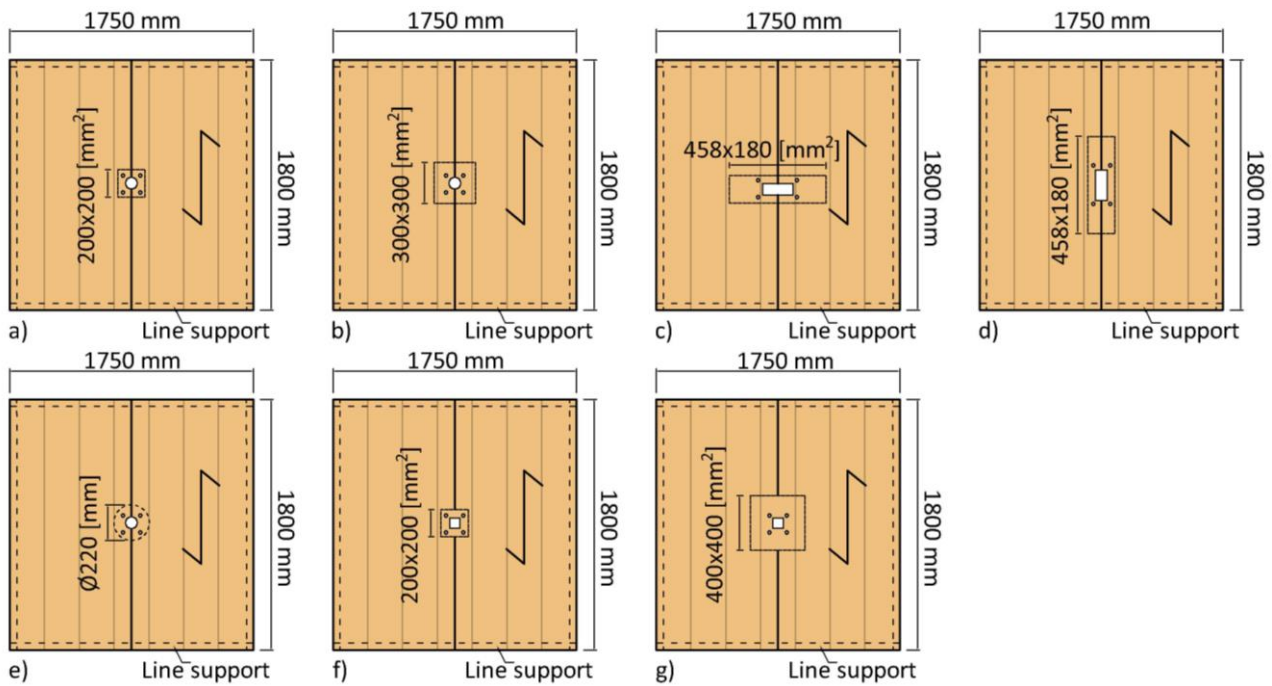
Different column geometries: a) square plate with stub (S1-S4, S6-S9, S15-S16); b) square plate with wood stub (S5); c) rectangular plate with wood stub (S10); d) rectangular plate with wood stub (S11); e) round column (S12); f) square plate and HSS (S13); and g) square plate and HSS (S14).
